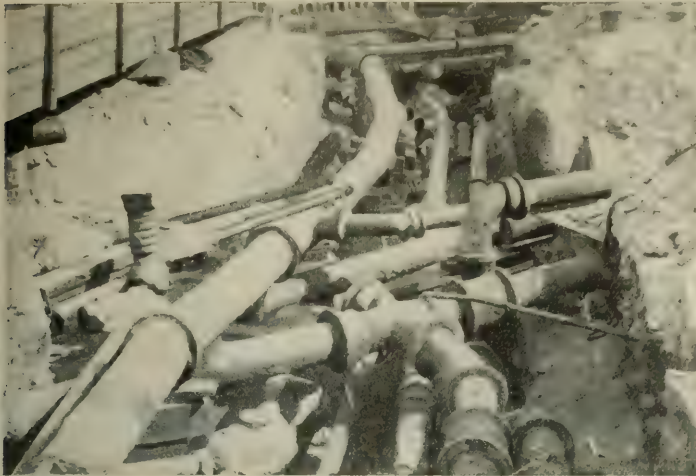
A NEW YORK STREET CORNER, SHOWING UNDERGROUND PIPE CONSTRUCTION.
